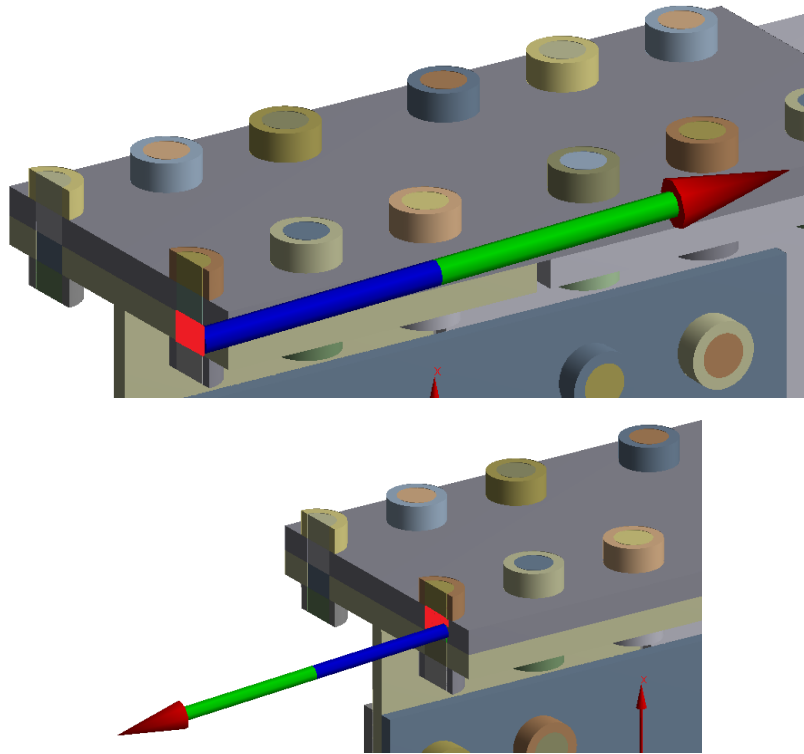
Bolt shaft shear force reaction in the flange (above) and flange plate (below).
